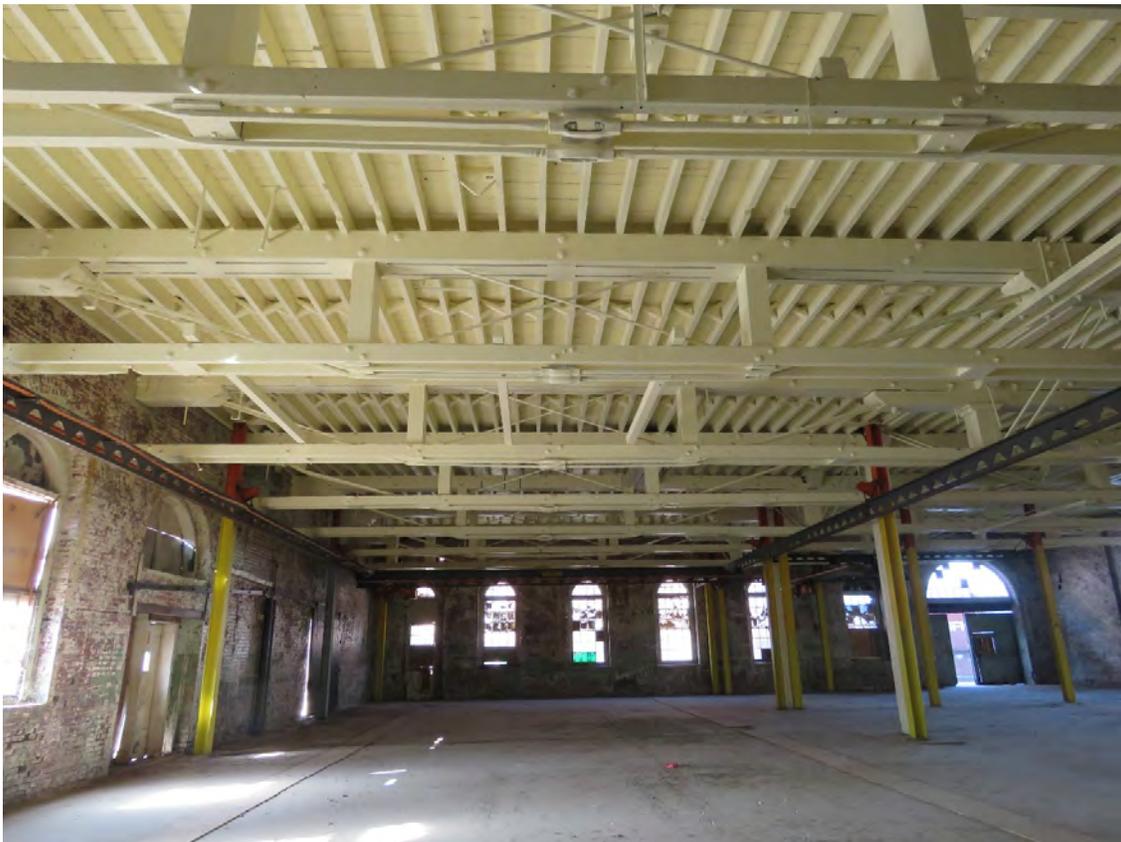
View of first floor interior, Planing Mill, looking west (corresponds to hardcopy photo 22 of 35).
